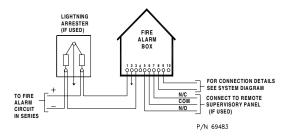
Typical Wiring Connections - Gamewell-FCI Master Fire Alarm Box
